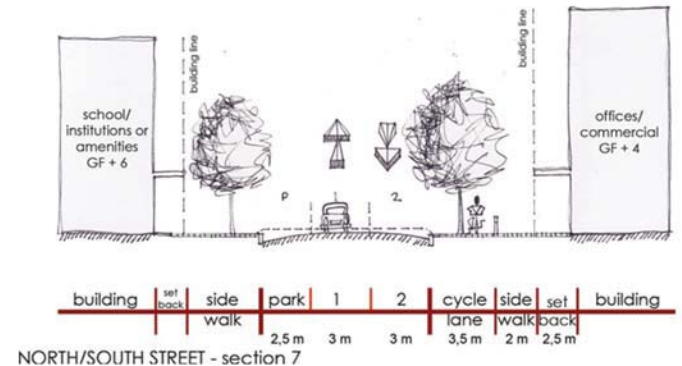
A typical section through a north/south street indicating overhangs, sidewalks and cycle lane
